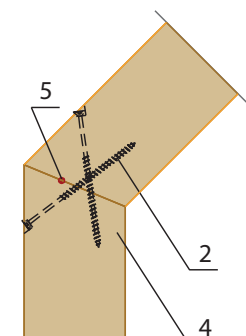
DETAIL OF A LONGITUDINAL JUNCTION 62 - WITH OVERLAP
